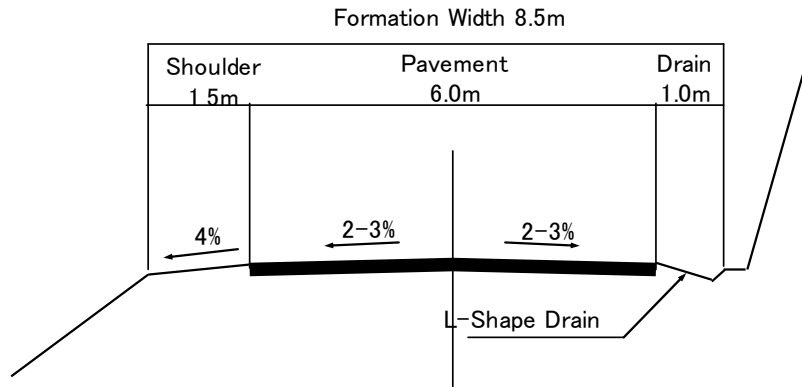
Standard Cross-section (National Highway / Double Lane)
